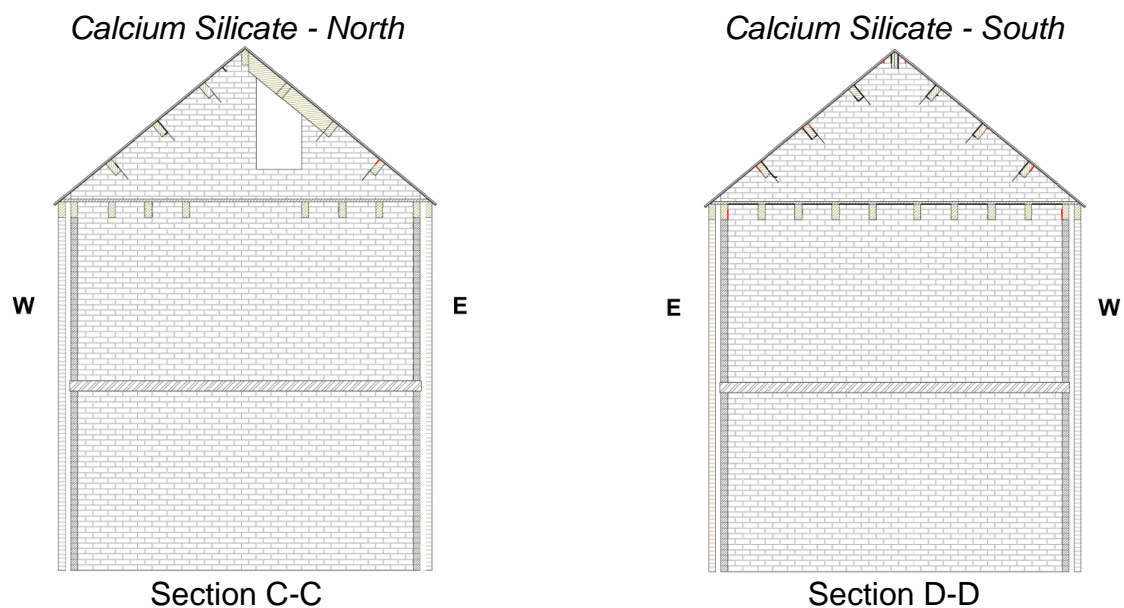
EQ-NPR 33% cracks - Calcium Silicate transverse walls.
